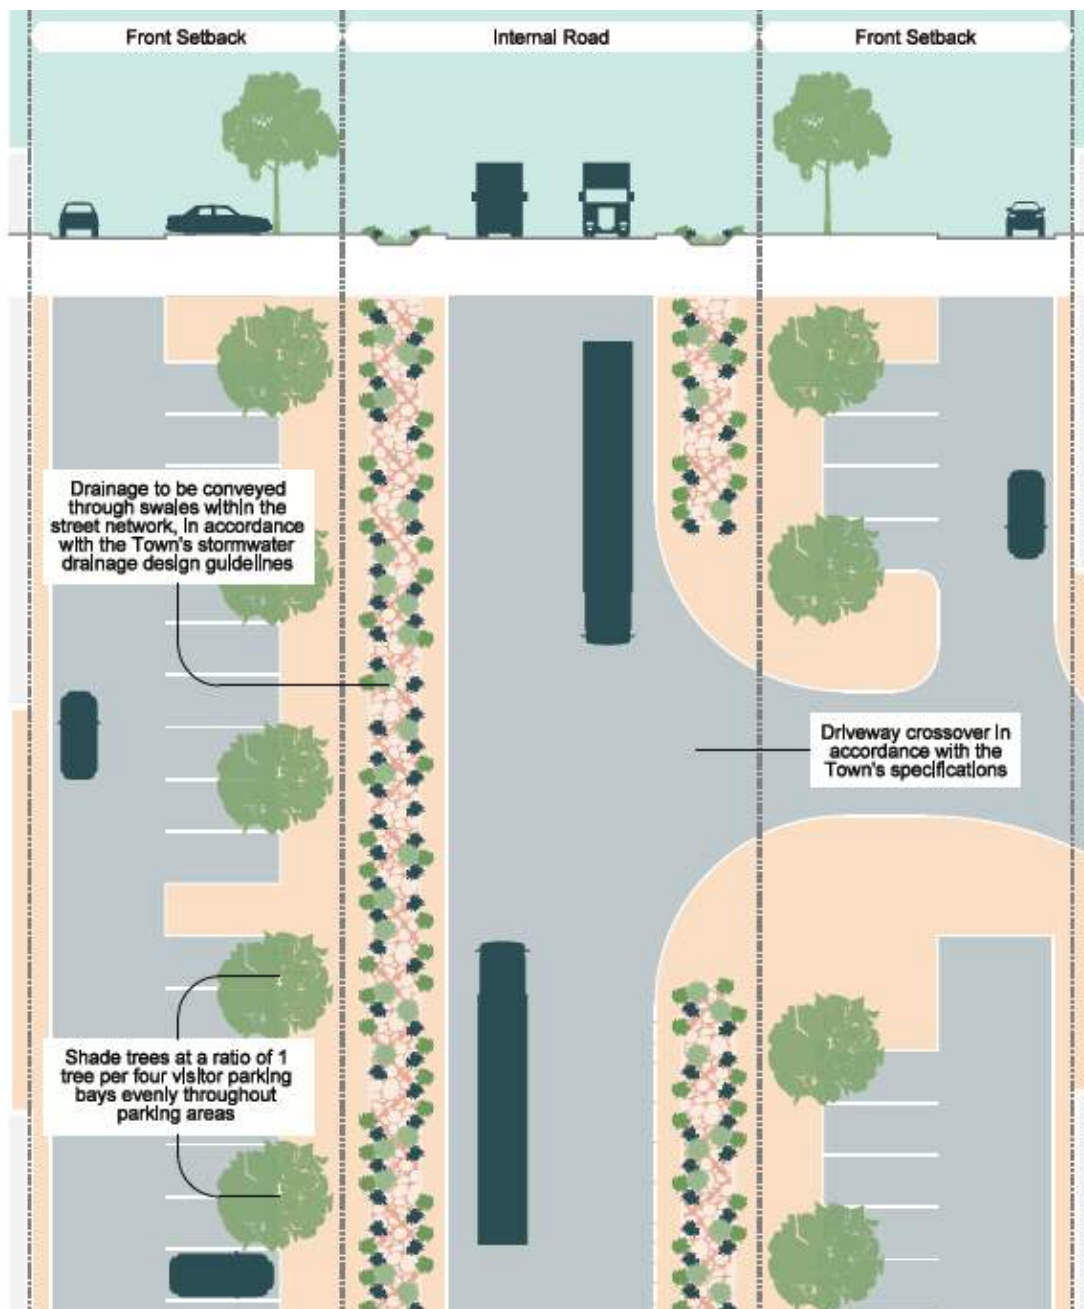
Highway Precinct – Highway Precinct Access Road arrangement and example of indicative parking layout and setbacks (source: Highway Precinct Design Guidelines, Town of Port Hedland, 2020)
